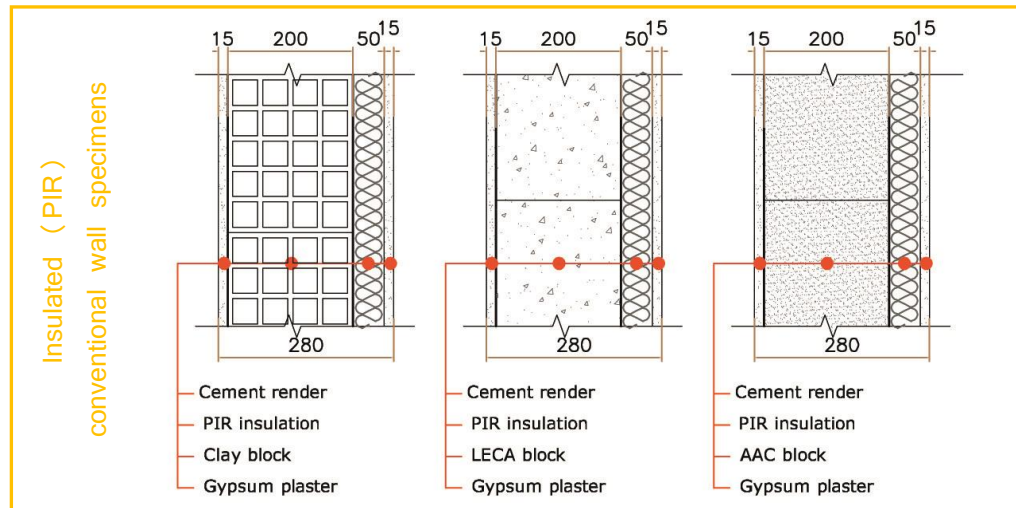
Detail of the construction layers of wall specimens insulated with PIR, dimensions in mm
